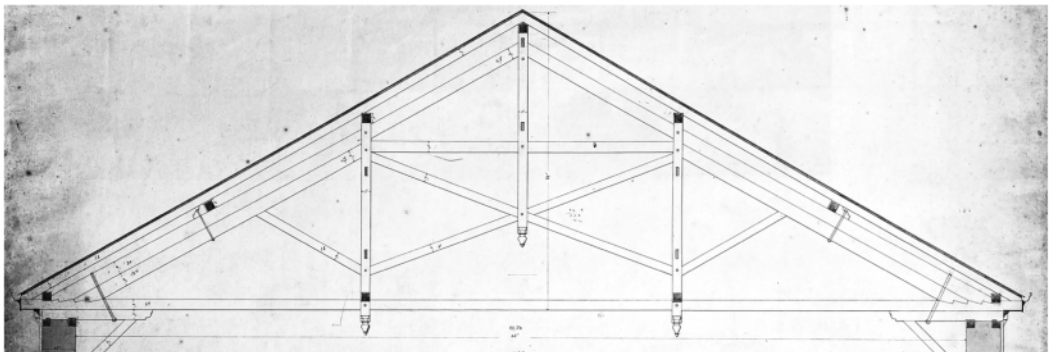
Historical plan of the principal roof truss in Solothurn by Wolff, built 1864, span 19.5 m (Solothurn City Archive, folder B81.91.1.6, plan XI).
